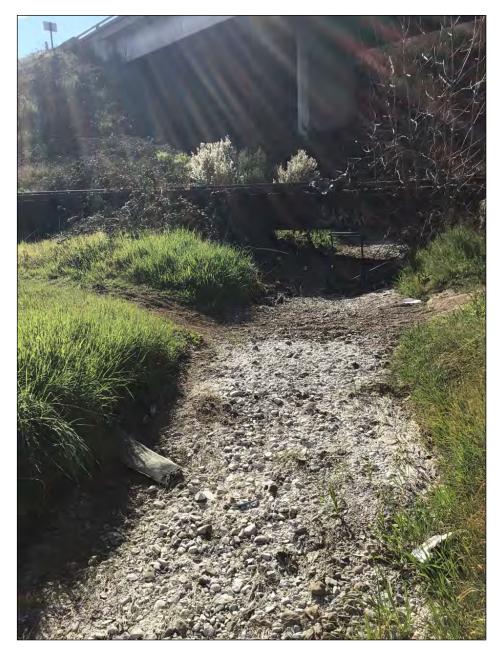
Drainage D-2 near Highway 101. Photo looking west.
